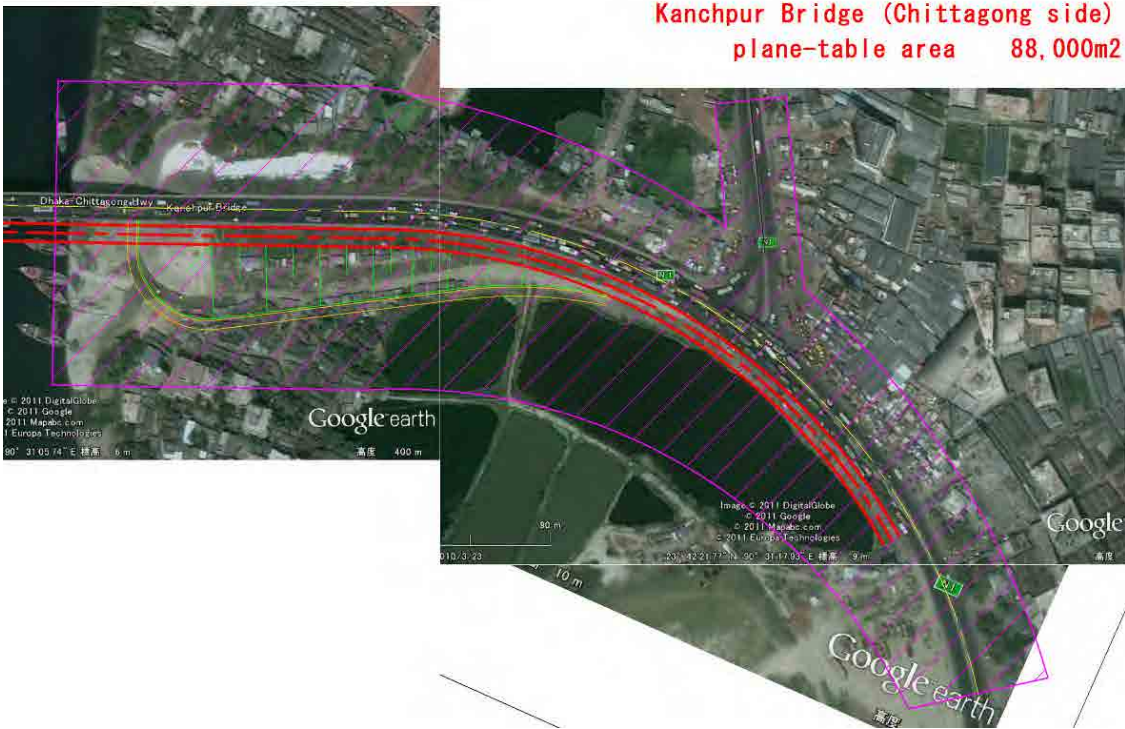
Kanchpur Bridge (Chittagong side) Plane Table Survey Area
